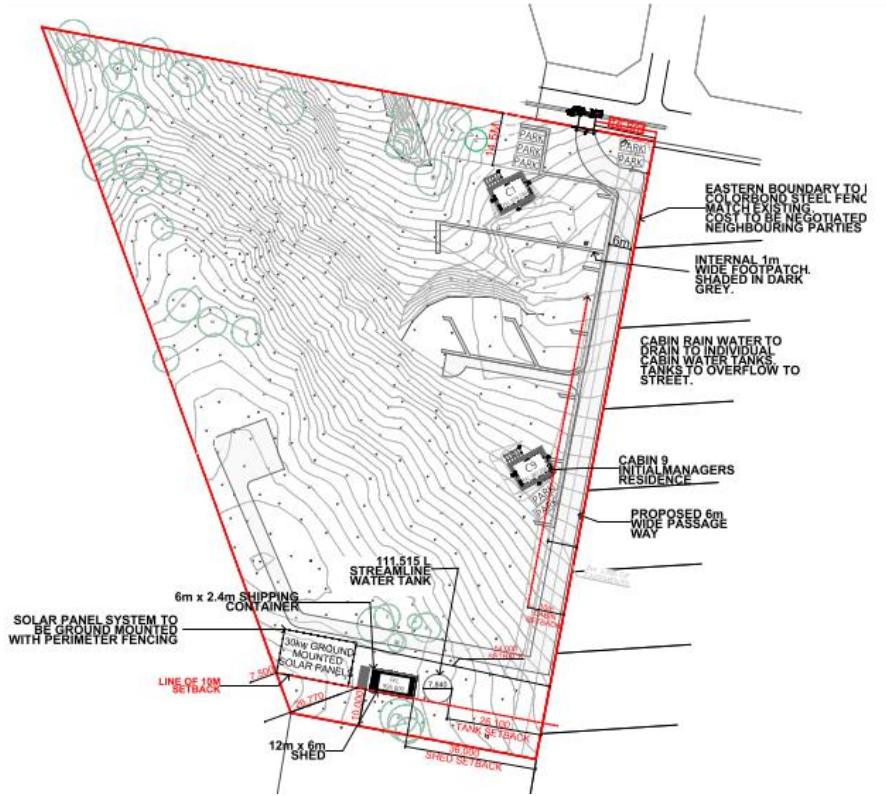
Proposed Site layout – Stage 1 (Cabins 1 & 9 (temporary manager’s residence and bushfire refuge), storage shed, solar panels and shipping container)
